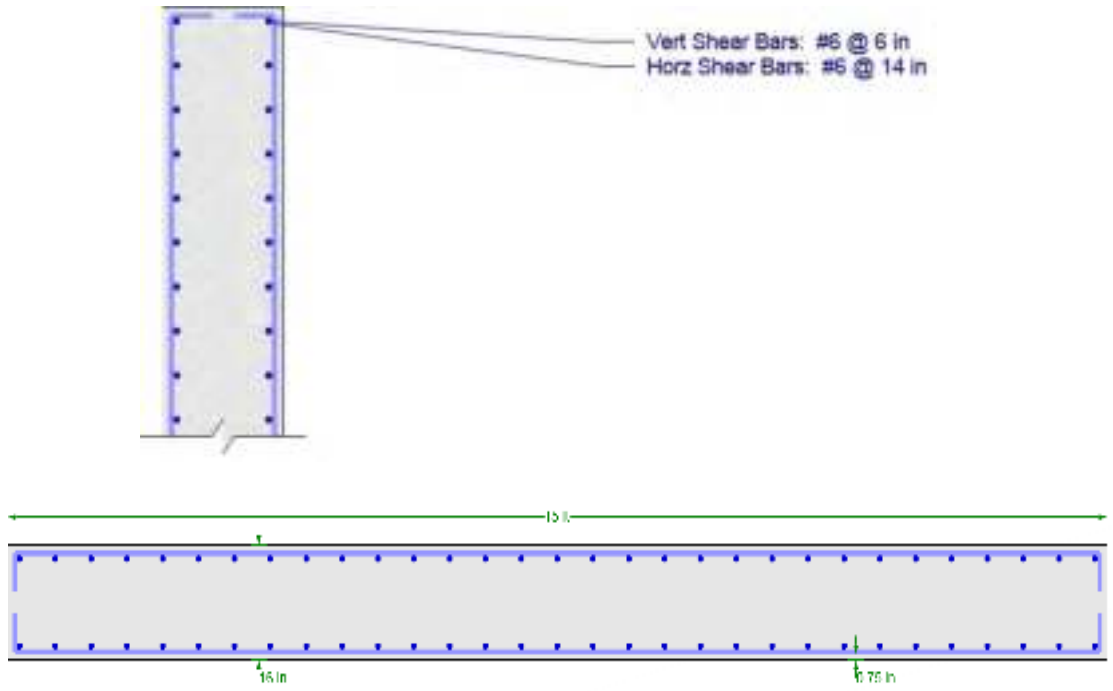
Building (B12-12S-L-O) Ordinary RC Shear Reinforcement Details; Wall Section for Floors 1-3
